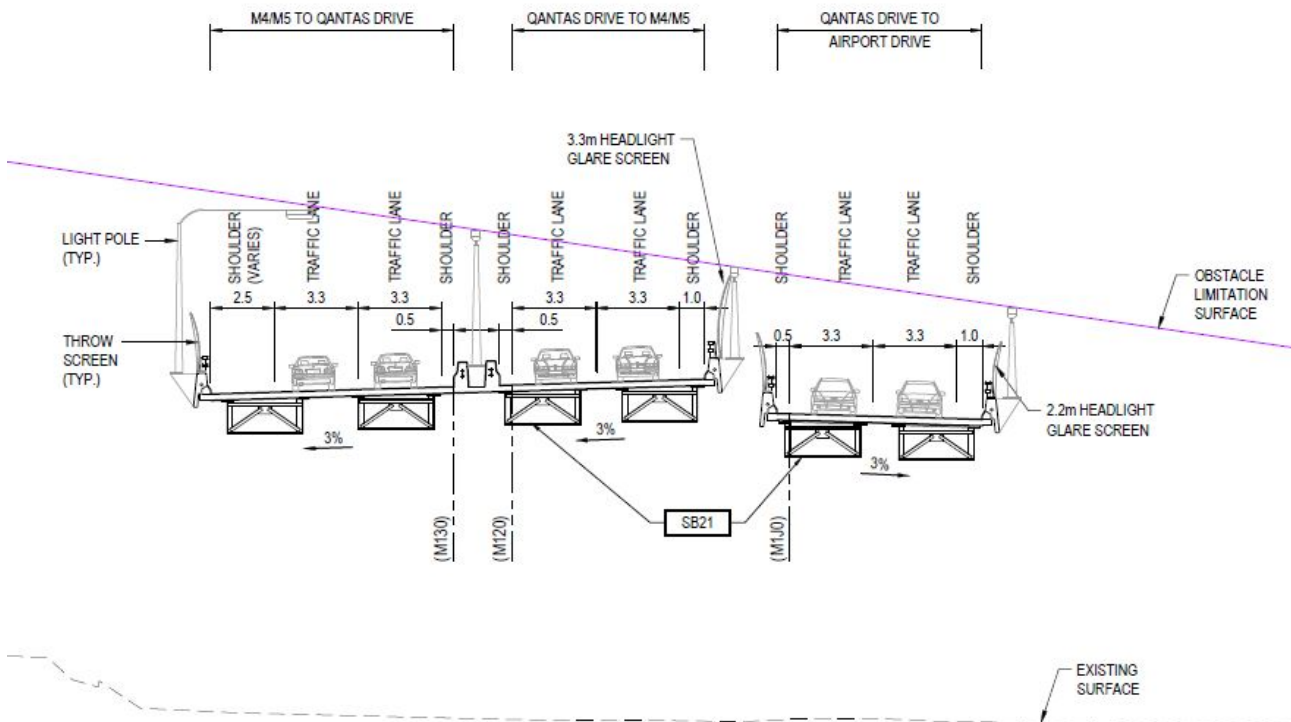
Typical section at bridges over Botany Rail Line showing clearance to OLS
